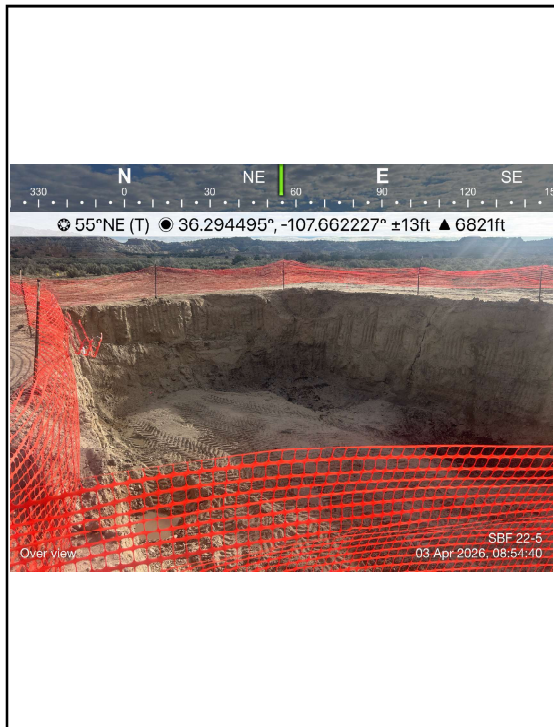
Looking northeast at final north wall, east wall, and base of the excavation. The deeper portions of the base of the excavation terminated on gray shale.
